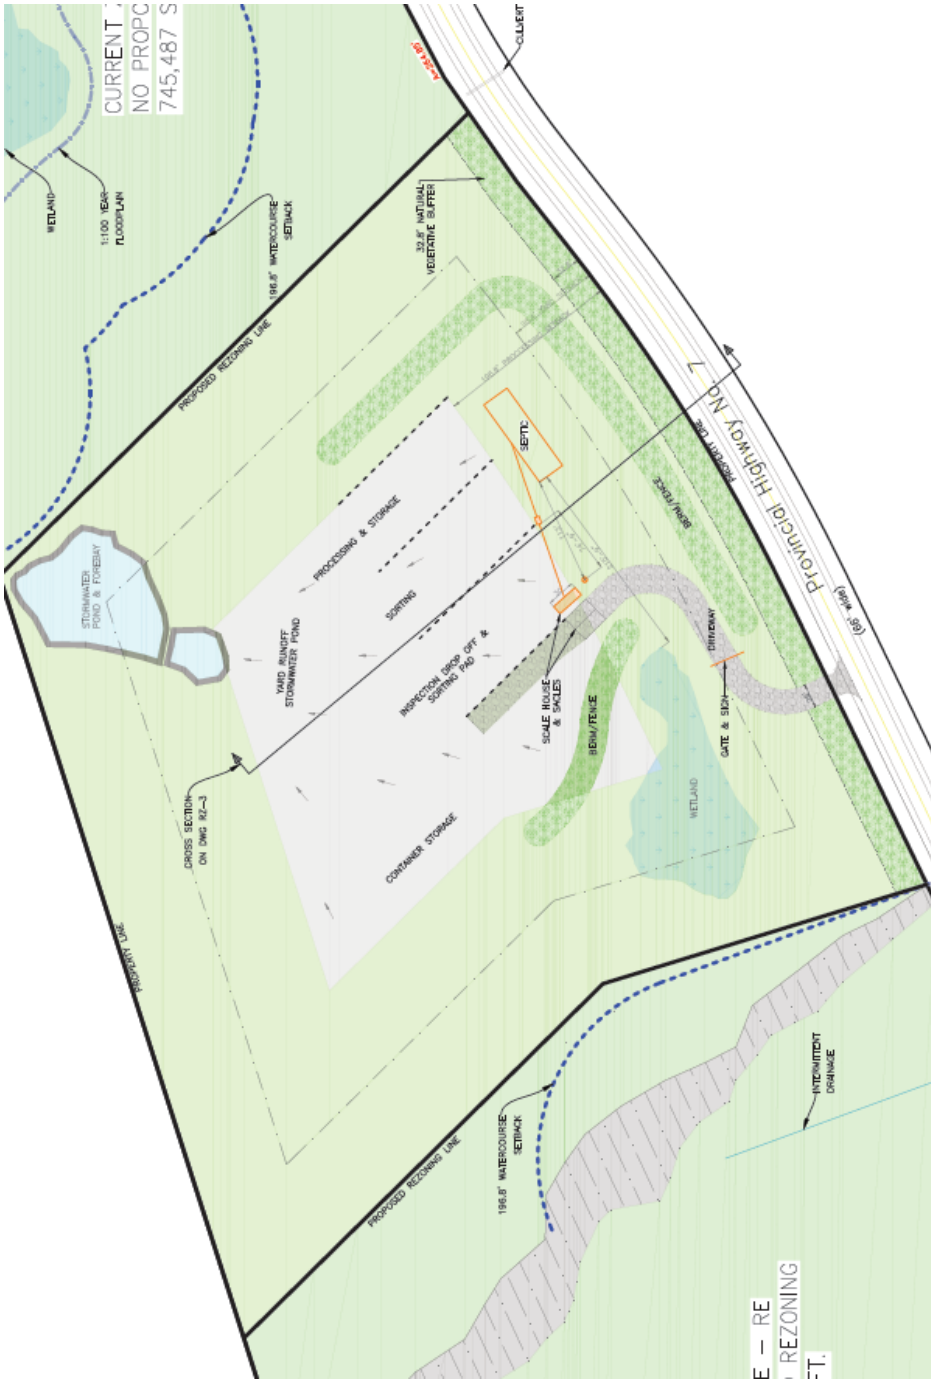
Concept Plan showing the C&D Processing Facility (dwg RZ-2)
